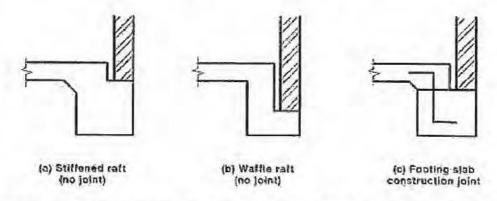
EXAMPLES OF FOOTING SYSTEMS REQUIRING NO JOINT TREATMENT
